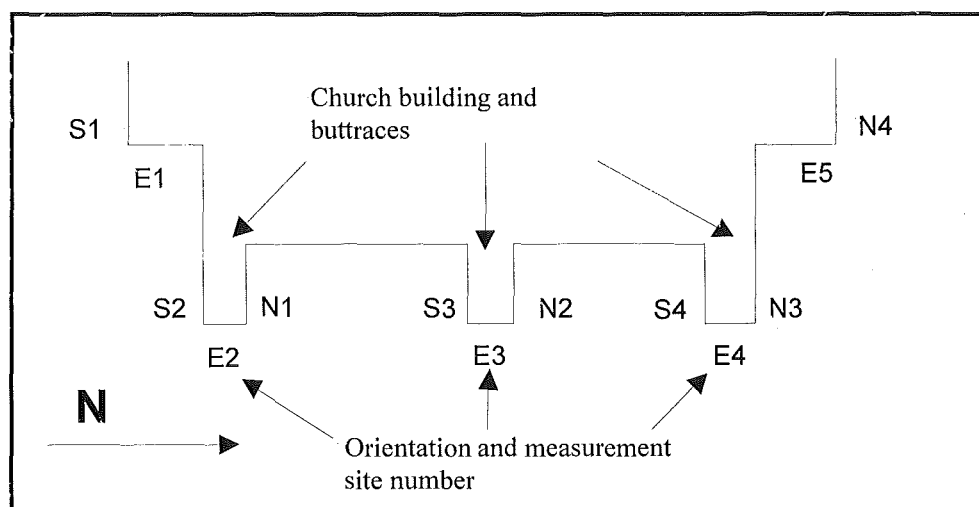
Site plan and measurement site distribution of Princetown church.
